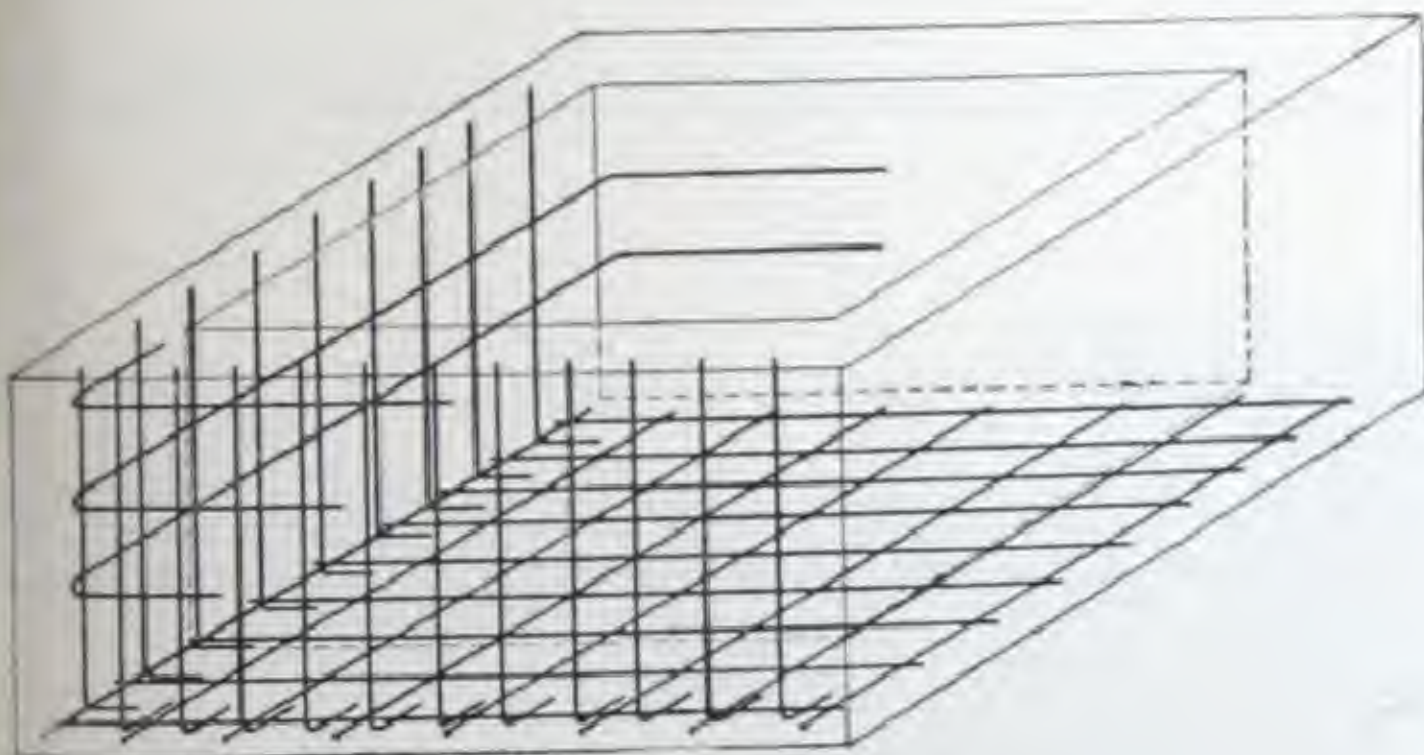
Above and below—details of reinforcement, placement showing bends and turnups in corners.
